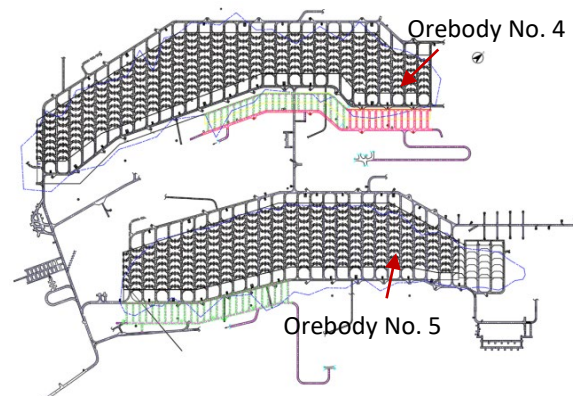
Plan view of orebodies and layout of the 434 mamsl extraction level in Tongkuangyu mine
